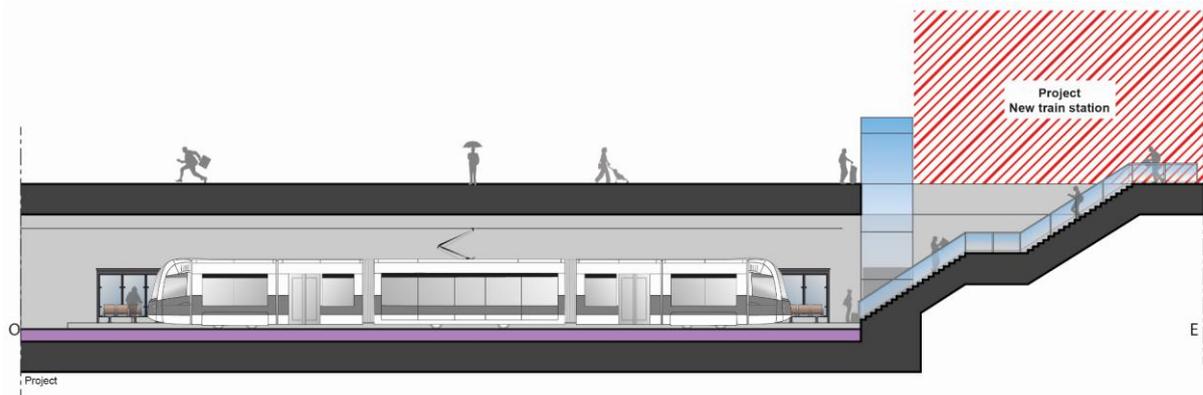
Tramway in tunnel option - longitudinal section in Ülemiste Station - Egis
